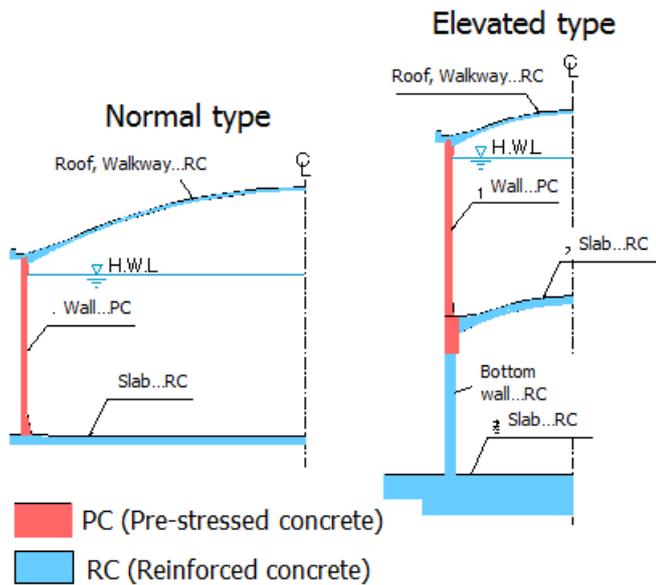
Arrangement of PC tendon and rebar in a PC tanks
